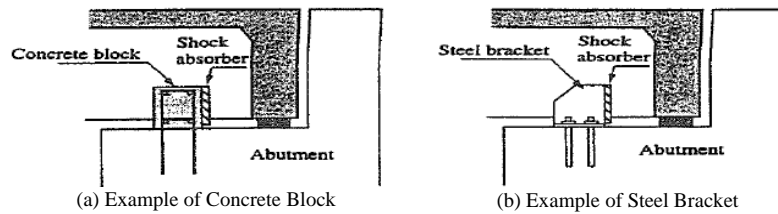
Unseating Prevention Structures Providing Protuberance on the Superstructure or the Substructure
